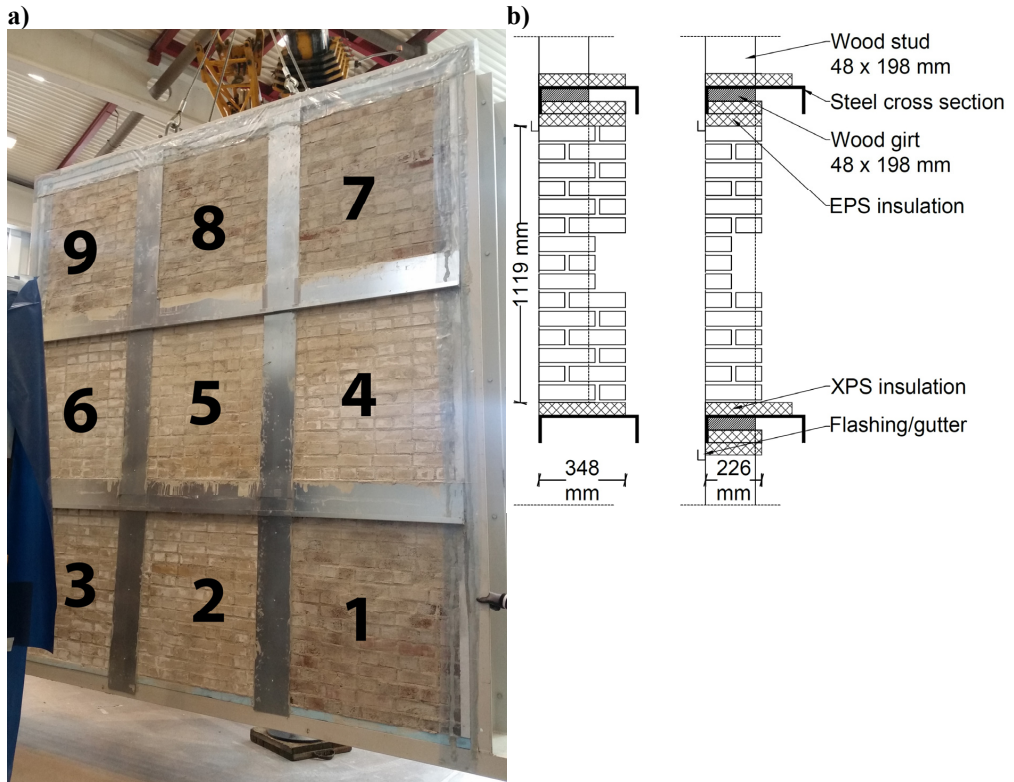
a) Test wall divided into 9 wall segments, b) cross sections of brick wall segments of 1.5- and 1-brick thickness, respectively.
